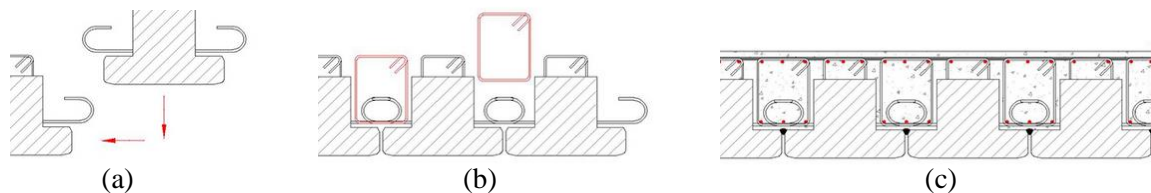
Colocation detail of Poutre-Dalle System [45]
